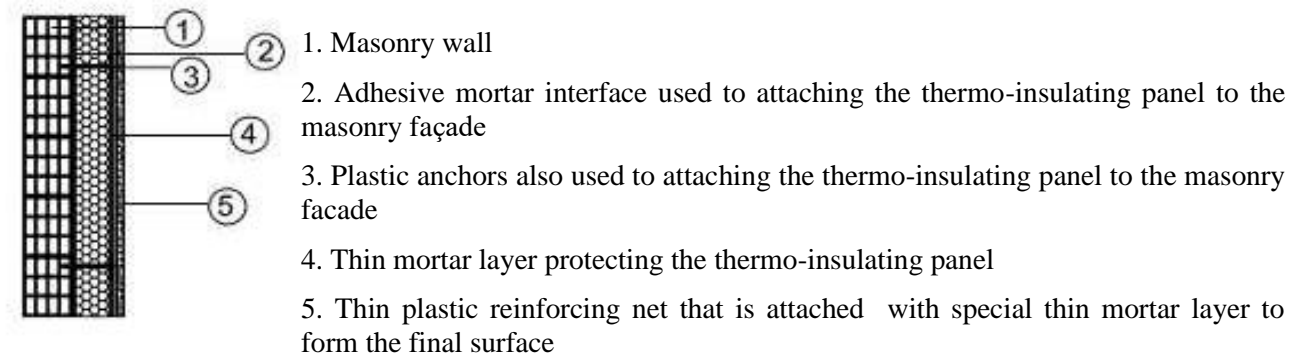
Construction detail of the masonry specimens with the thermo-insulating attachment.
